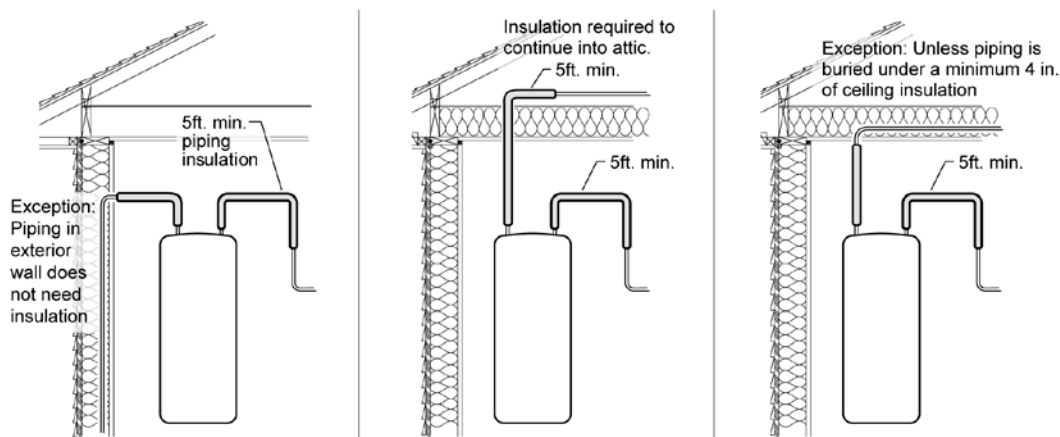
Pipe Insulation Requirements First Five Feet from Water Heater
